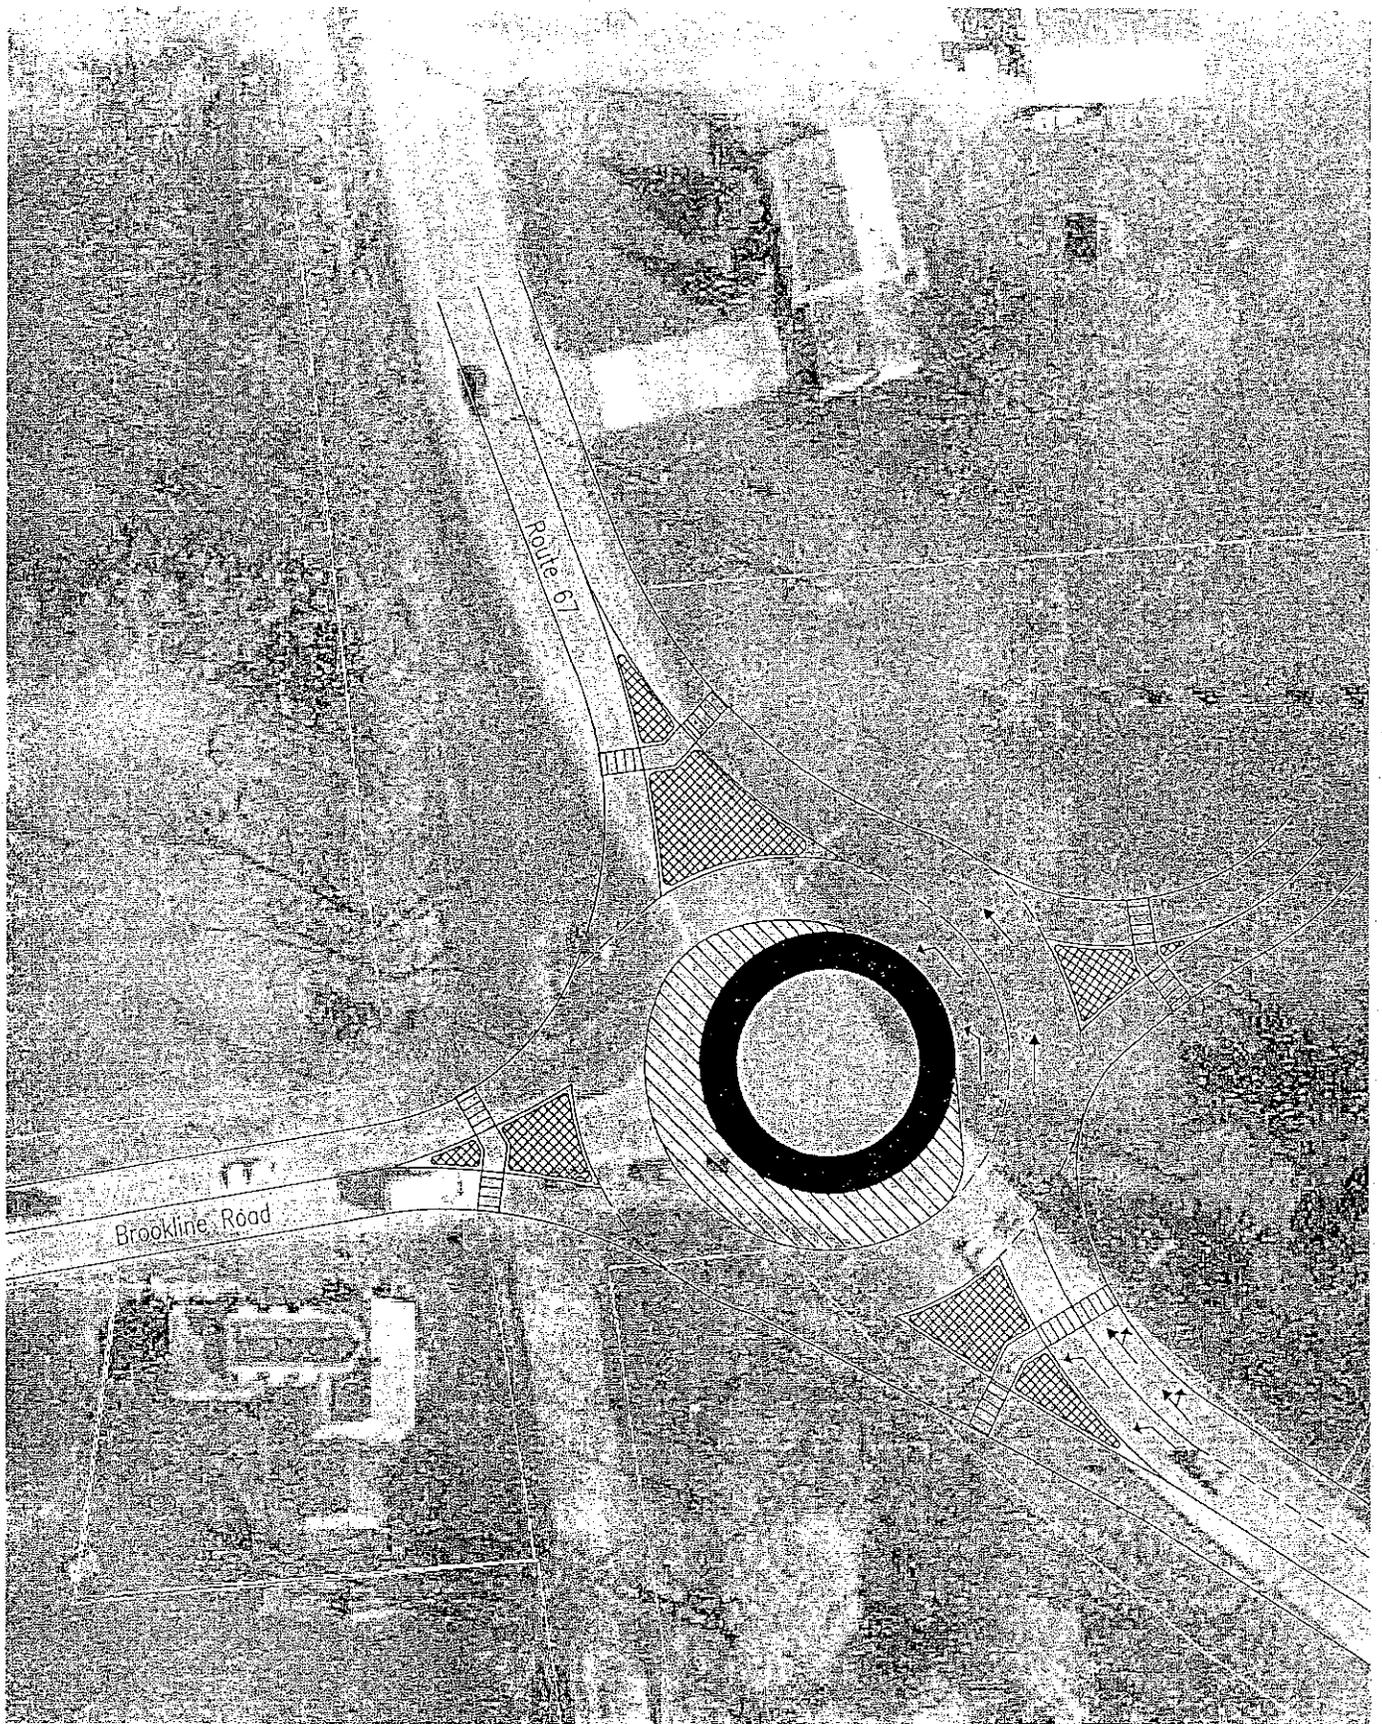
PROPOSED ROUNDABOUT AT ROUTE 67 AND BROOKLINE ROAD
